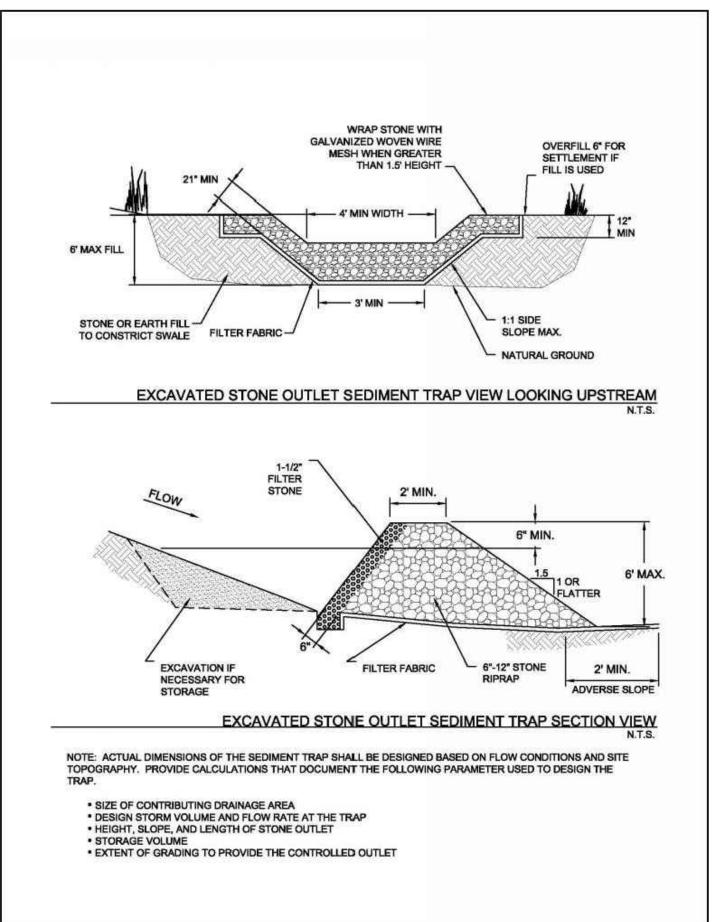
Schematics of Excavated Stone Outlet Sediment Trap
